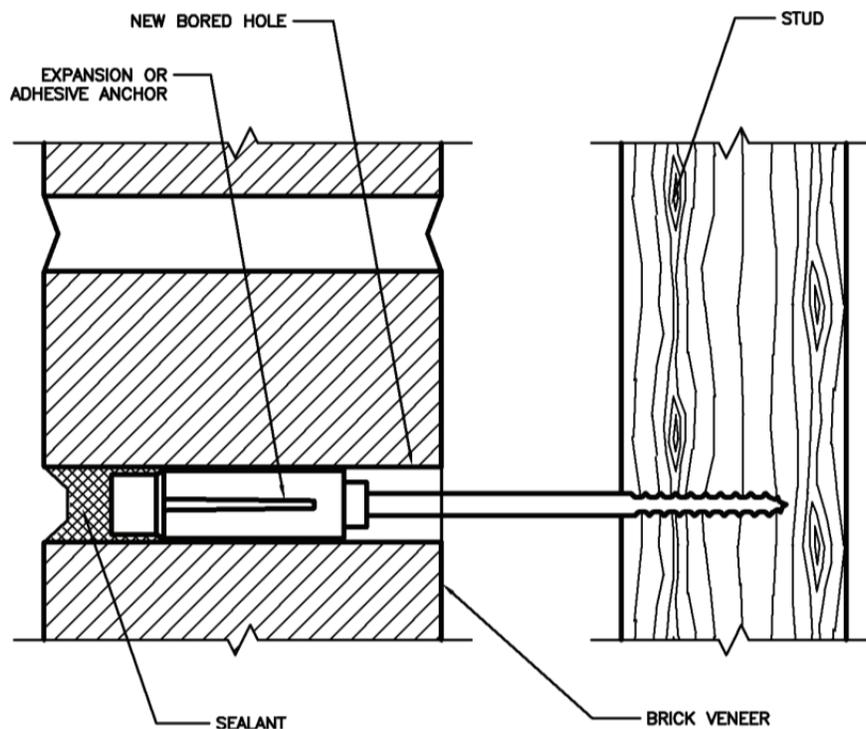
Typical retrofit fastener for brick or stone veneer (from ATC, 2002).
